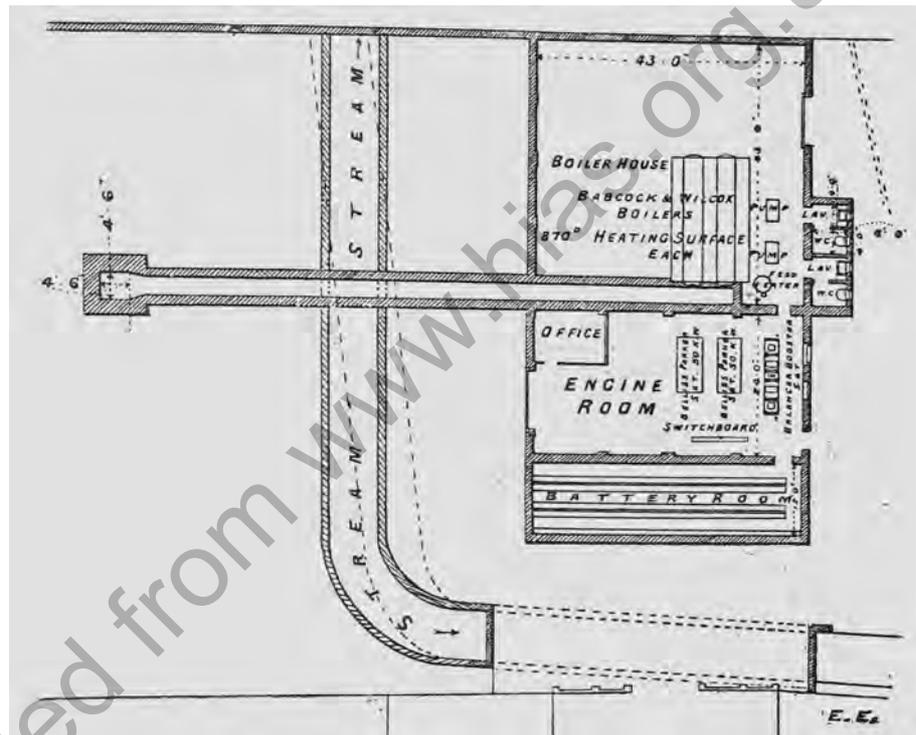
Plan of the power station of 1898 as built by Edmundsons. North is at the top of the plan.
